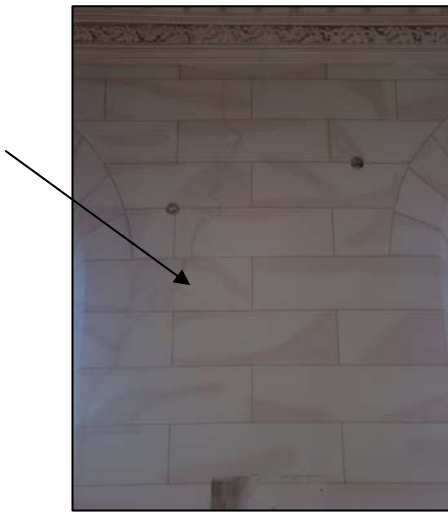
Arrows point to cracks due to weakened structure. (Photo: Author)
